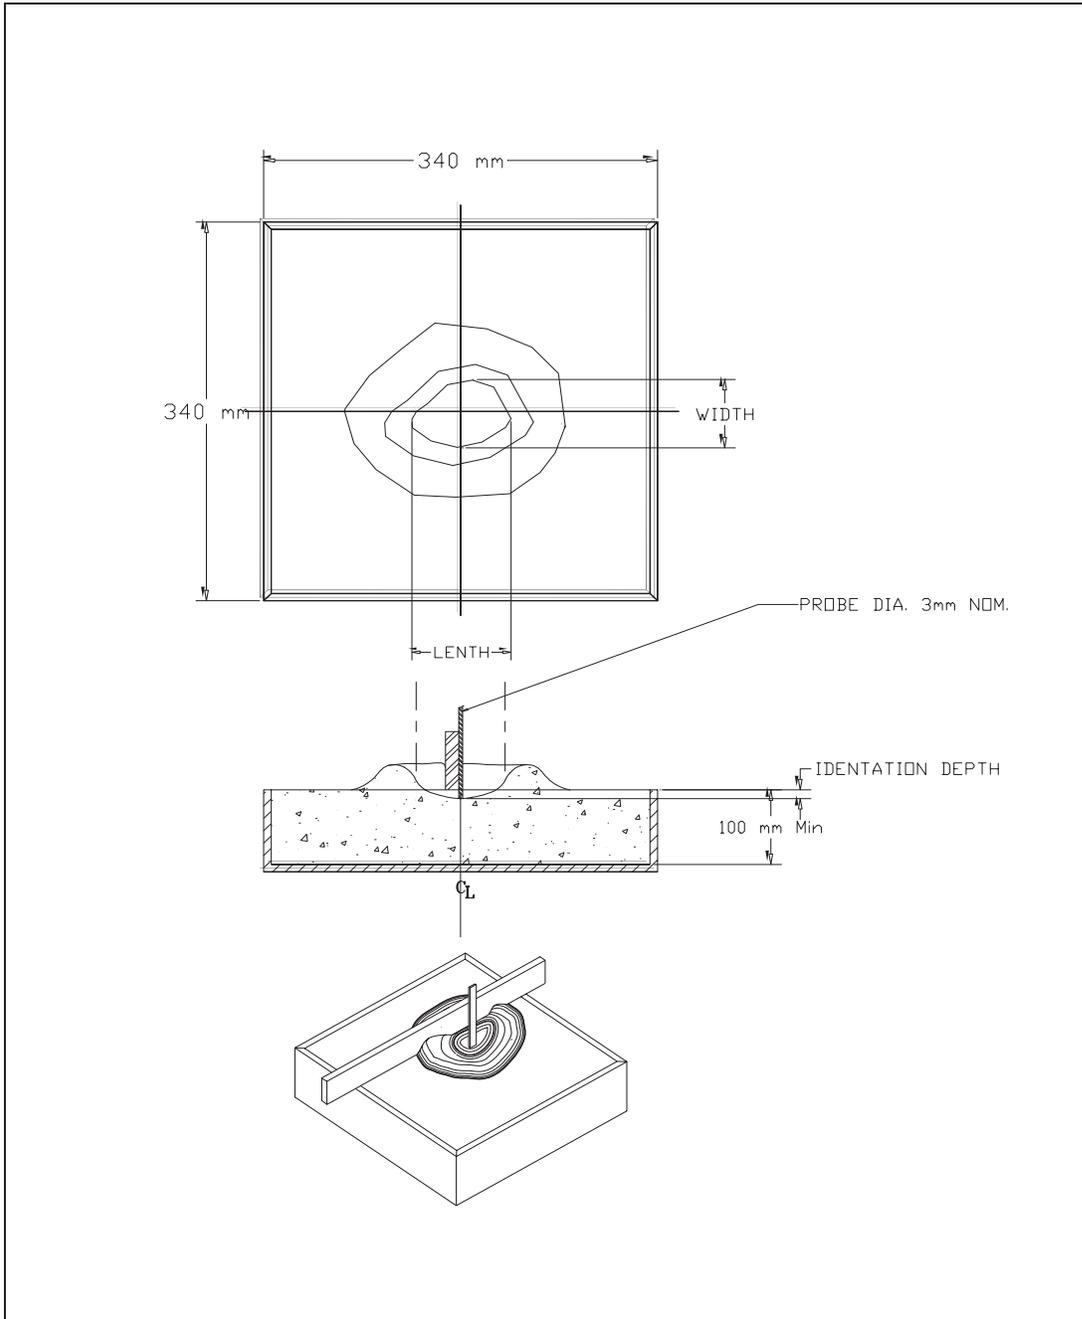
Clay Block Dimensions and Cavity Measurement
